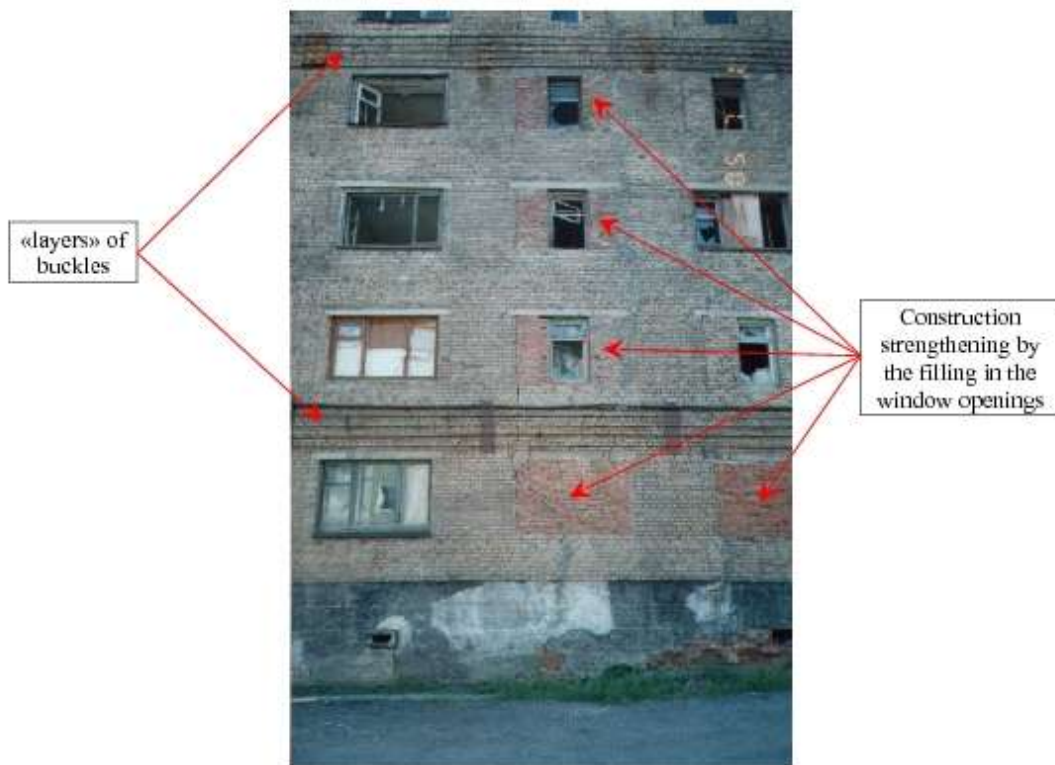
Emergency house №13 (fragment) on Lermontov street in Vorkuta
